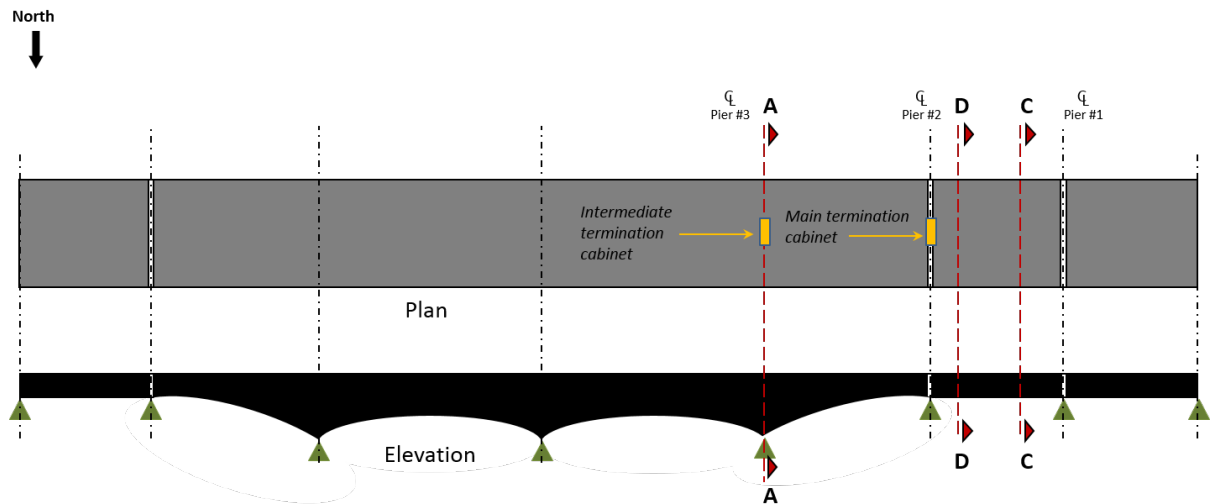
South Perimeter Bridge Instrumented Span [2]
